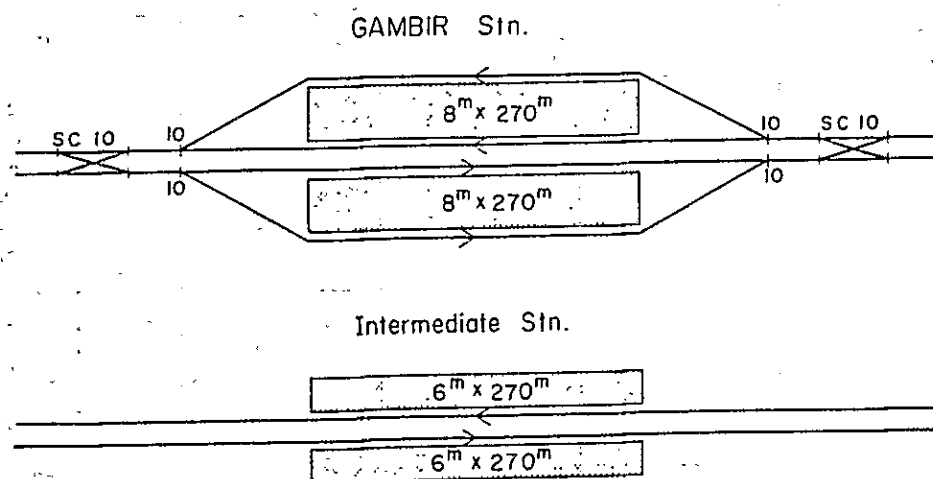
Sketch of Track Layout at Stations with Elevated Tracks
